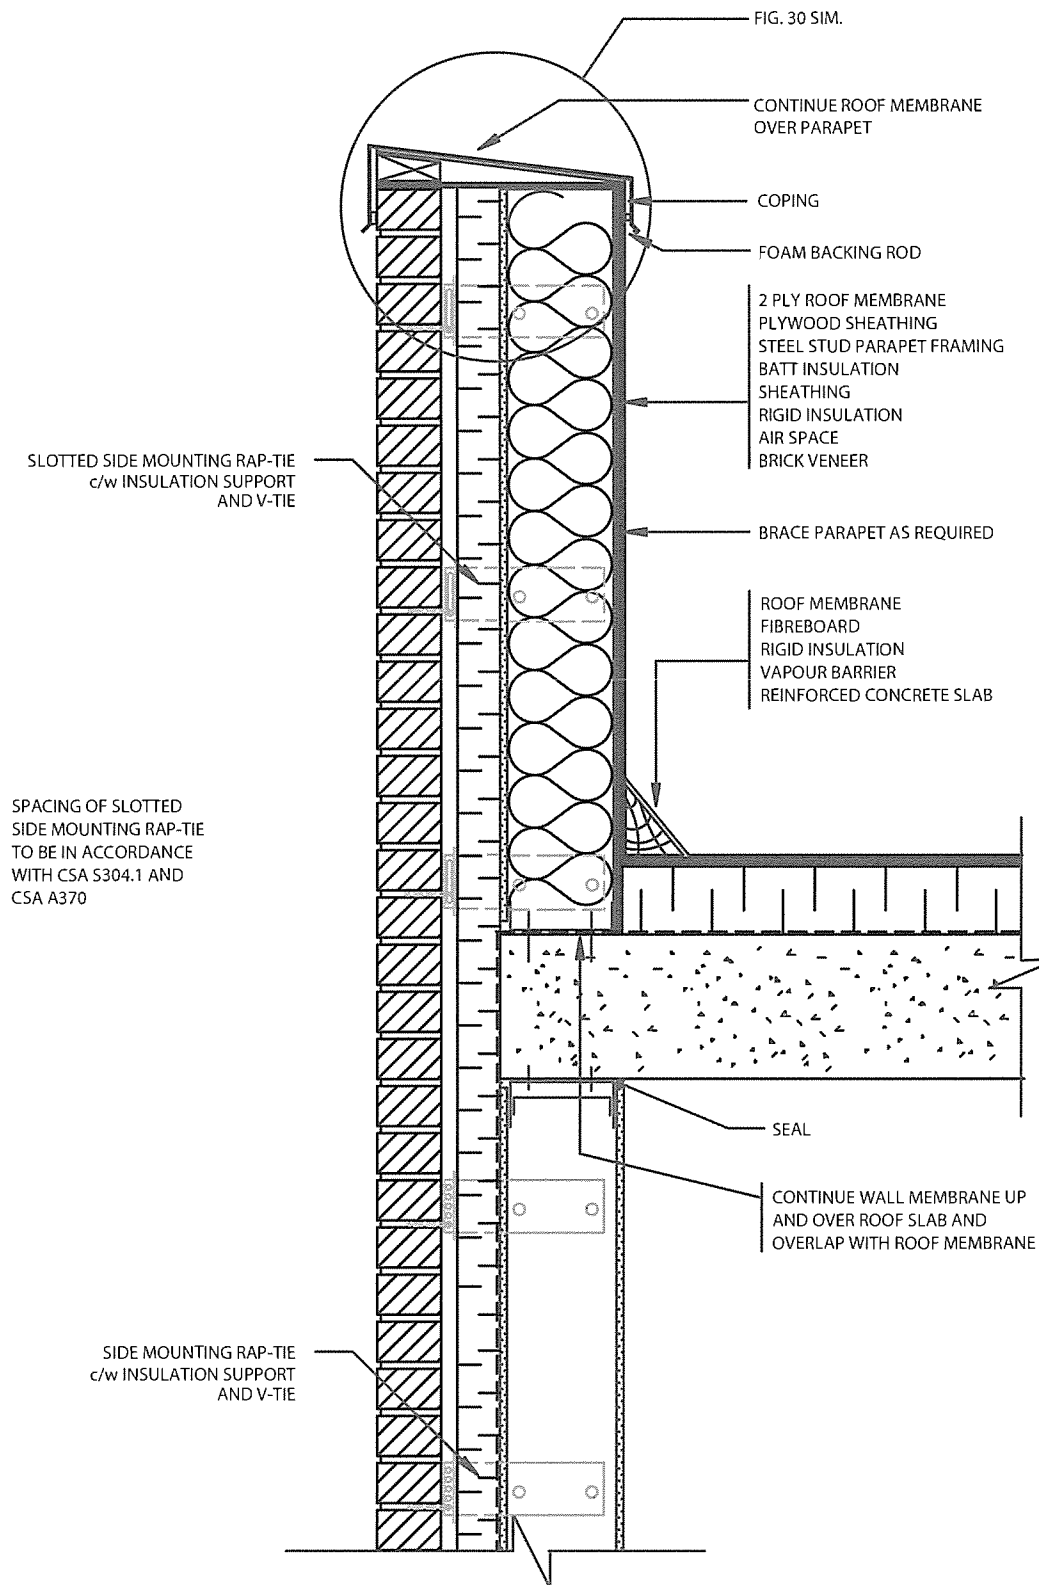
BRICK VENEER / CONCRETE BLOCK - DETAIL AT HIGH PARAPET
